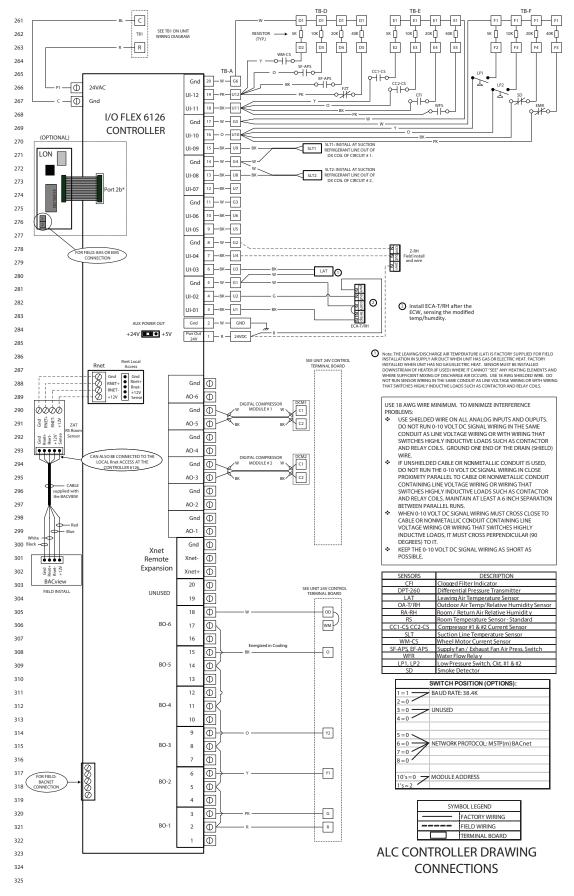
Controller Wiring for Dual Circuit Unit ECW and Single Speed Supply Fan
